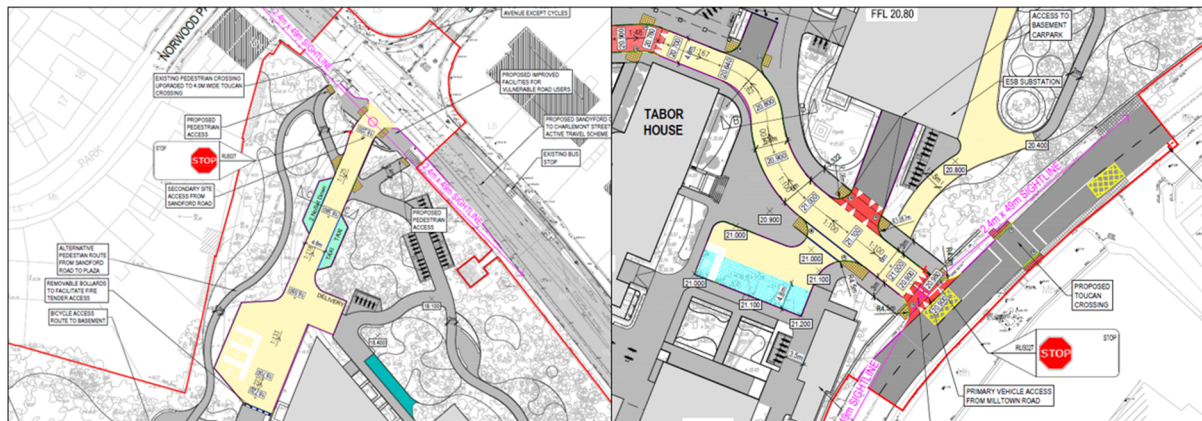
Extract of Subject Site Road Layout (Left: Sandford Road, Right: Milltown Road)
